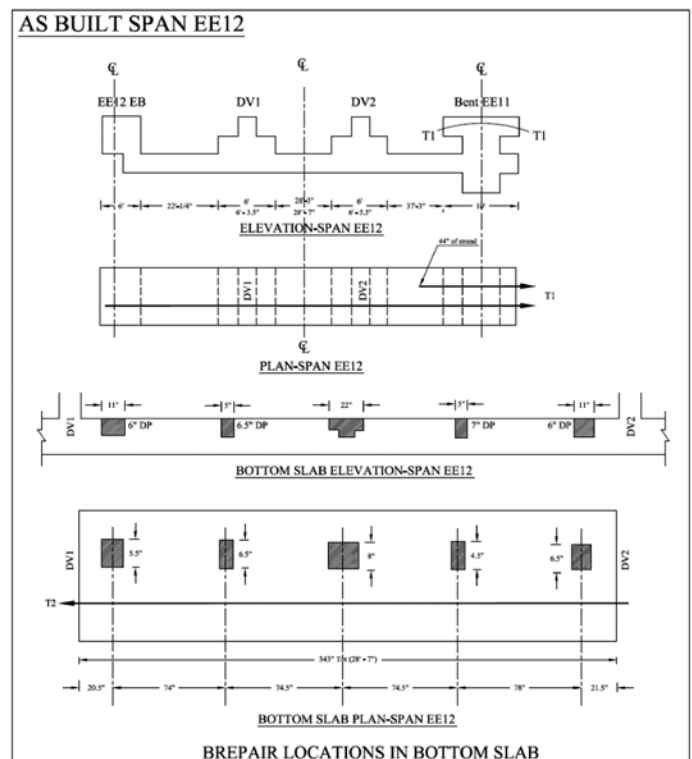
Repair locations in elevation and plan in thickened slab in Span EE12.
